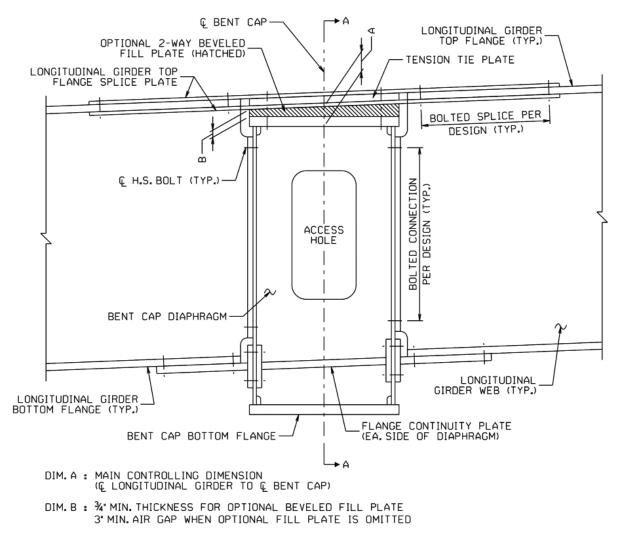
Longitudinal girder connection to steel box bent cap
